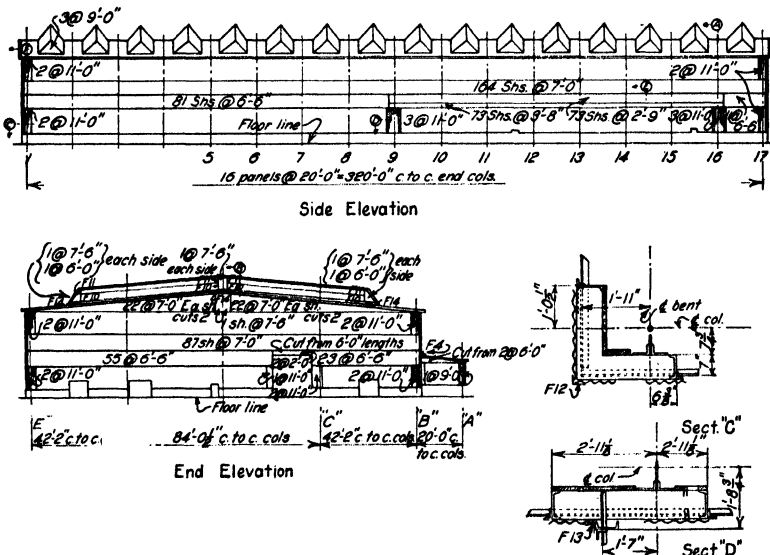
Corrugated steel plans for a machine shop (American Bridge Co.).
